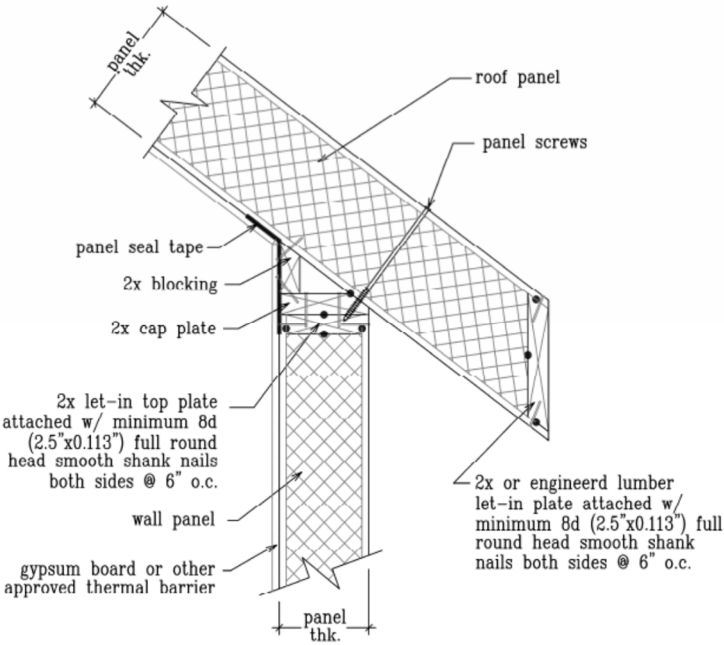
WALL PANEL TO ROOF PANEL WITH 2X BLOCKING
